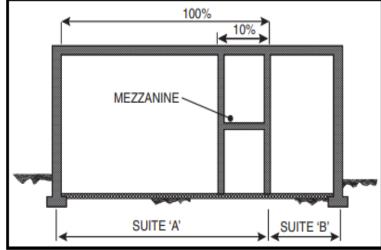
(4)-C Mezzanines in Multi-Tenanted Suites
